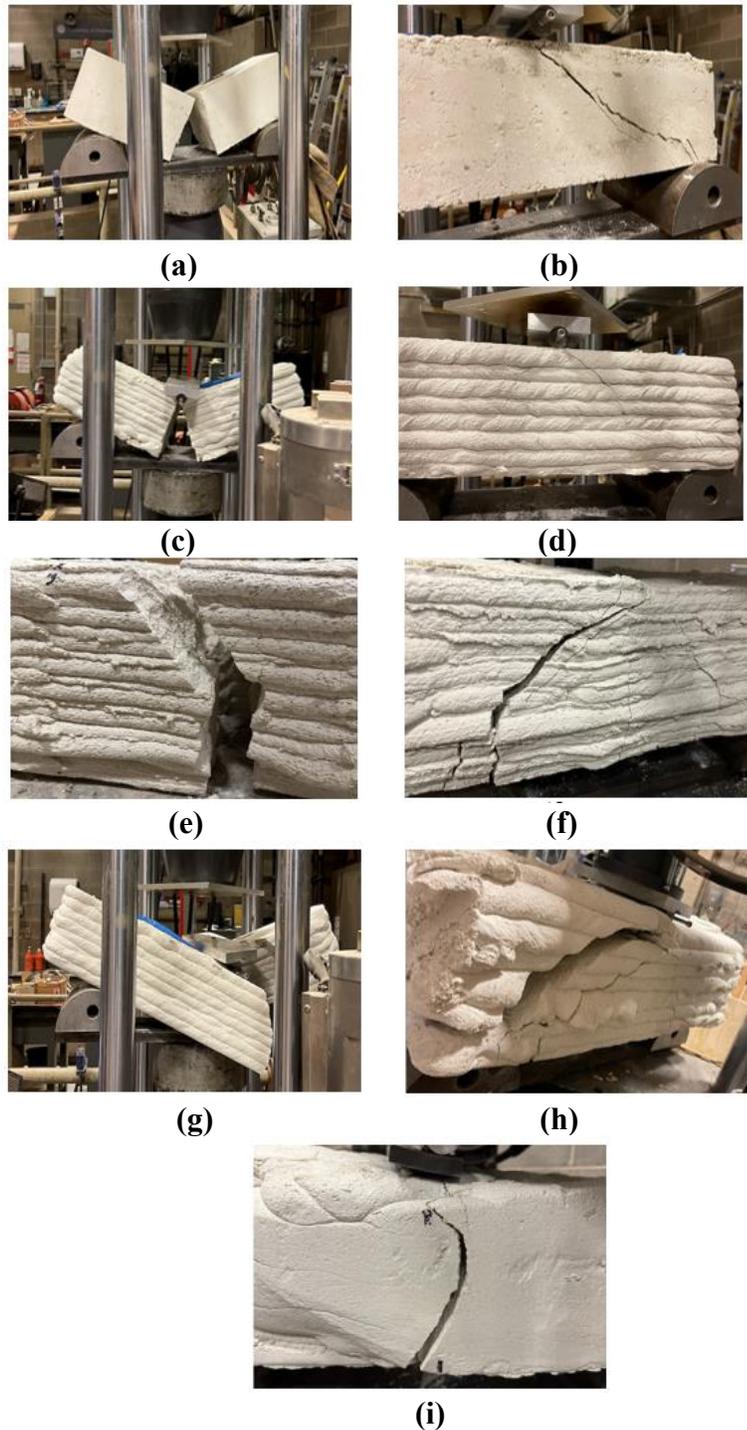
Failure Beams a) Cast plain beam; b) cast rebar reinforced beam; c) plain beam with printed formwork; d) rebar reinforced plain beam with printed formwork; e) plain beam with printed studs formwork; f) rebar reinforced plain beam with printed studs formwork; g) fully printed plain beam; h) fully printed rebar reinforced beam; i) fully printed staples reinforced beam
